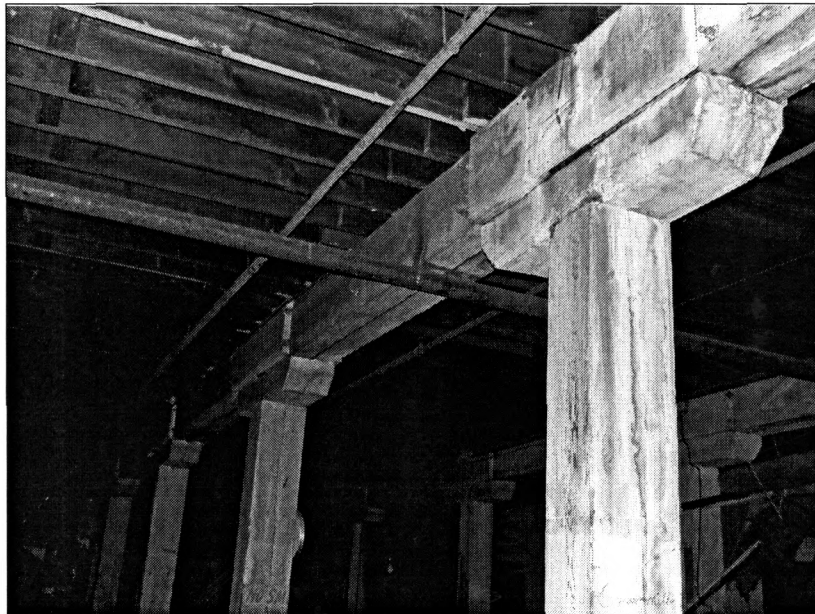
Column and beam junction (with plank covers) in building to east of former alley, view northeast
